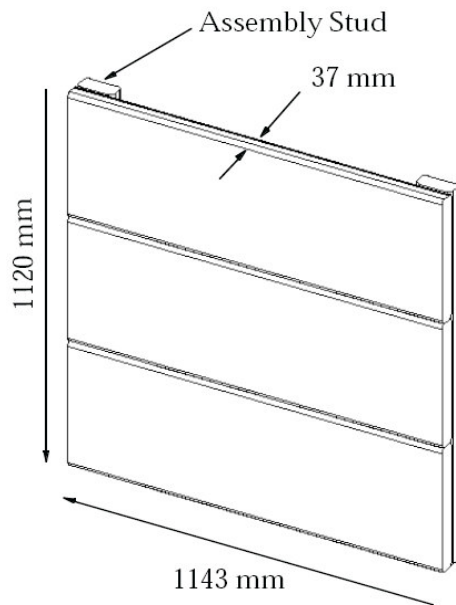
a: A single layer built-up lumber specimen consisting of three planks mounted on exterior frame.
